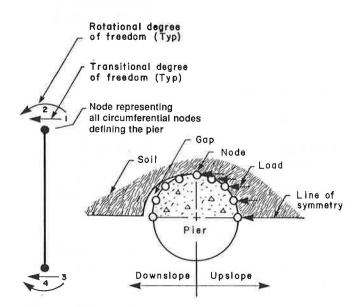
Pier elements: (*left*) pier spar element; (*right*) soil/ pier nodal interaction.
